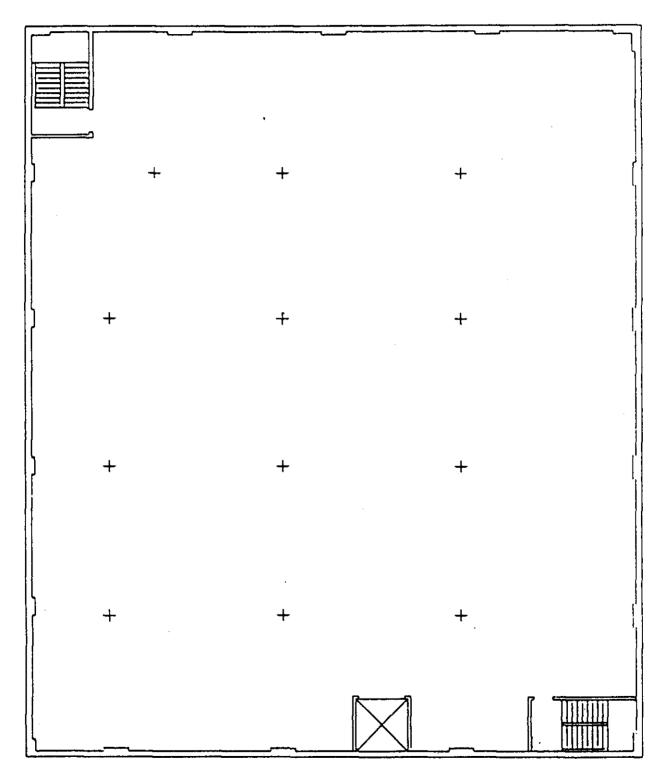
E-1 TYPICAL UPPER FLOOR PLAN Scale: 1" = 16'
